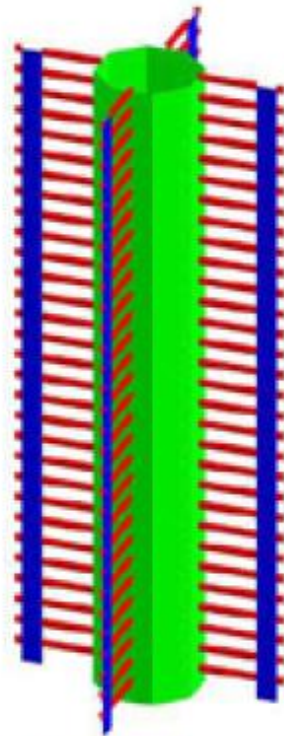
Proposed structural system for 30 storey timber building with CLT circular core. 4no (of 16) frames shown for clarity.
